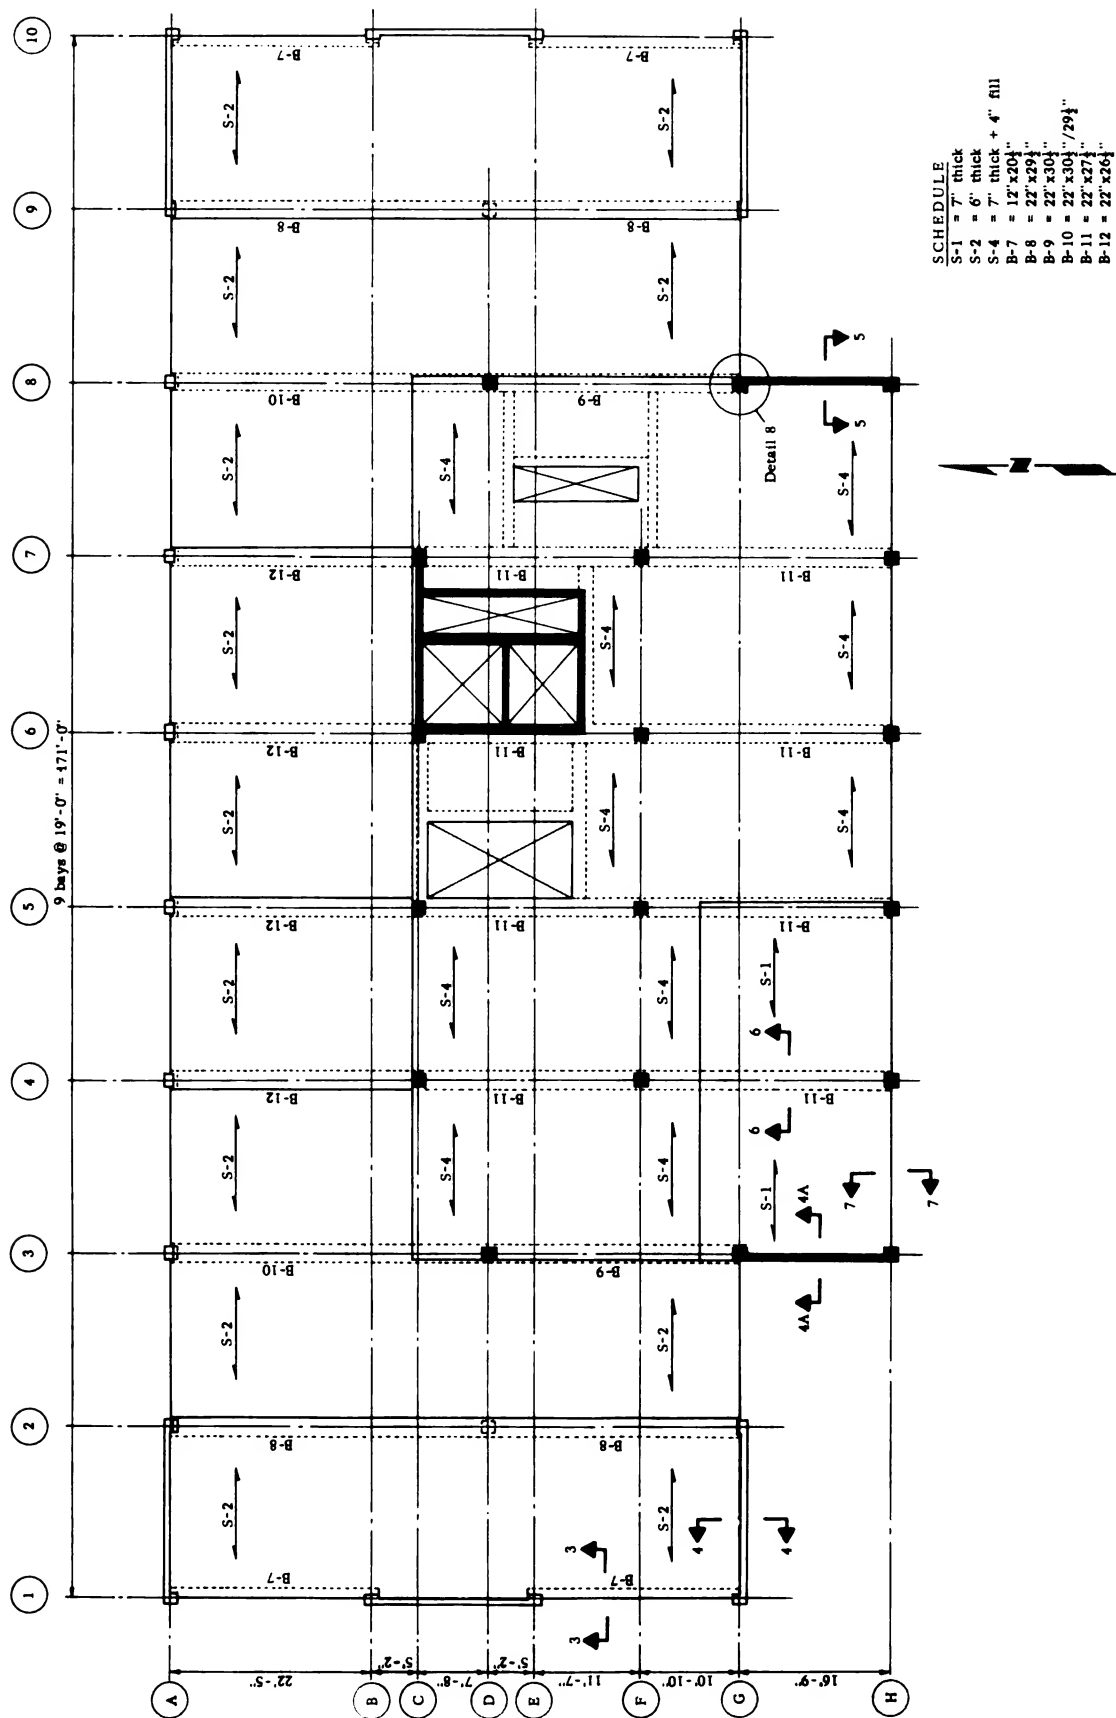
Indian Hills Medical Center. Roof and penthouse floor framing plan.
